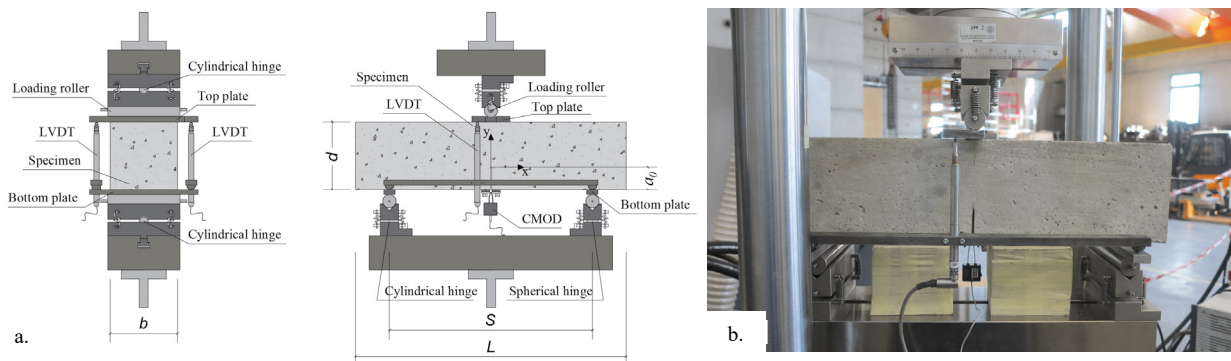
Fracture mechanics set-up: sketch (a) and photograph (b).
